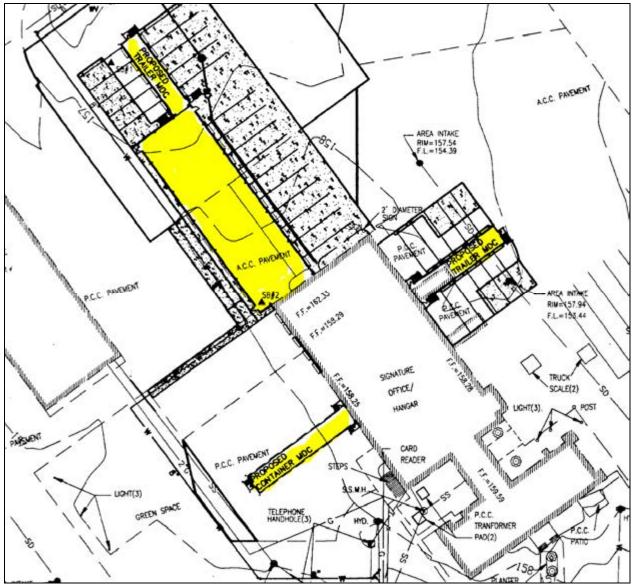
1999 site plan of Building 35. Additions are highlighted in yellow. (Source: Des Moines International Airport collection).
